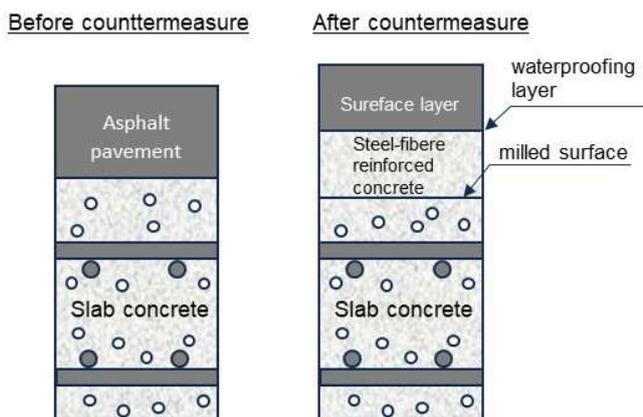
Example of Cross-Section of Top-Surface Jacketing Method
